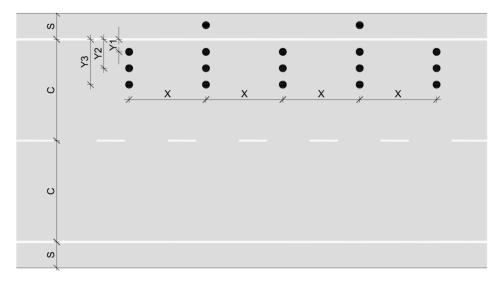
Plan of in-situ measures; "S" and "C" are shoulder and lane width.
